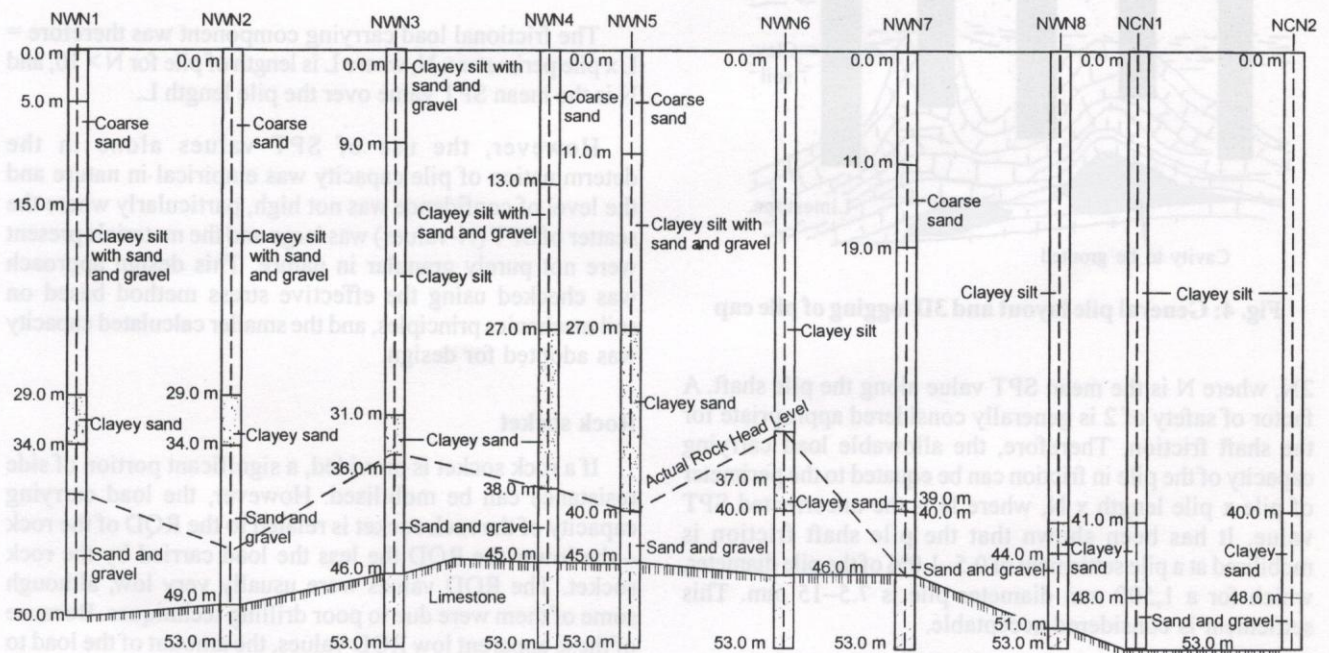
Generalised soil profile of the Ampang–Kuala Lumpur Elevated Highway area
